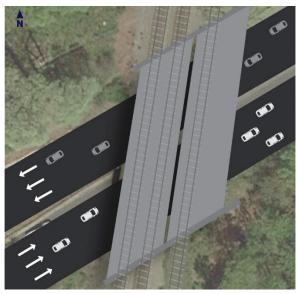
Proposed Typical Route 1 and Newington Road Improvements Figure from VDOT's CSX Bridges over Route 1 and Route 877 Conceptual Bridge Replacements Feasibility Study Report (February 2019). Note that only one track would be added on the new bridges as part of the Project.
